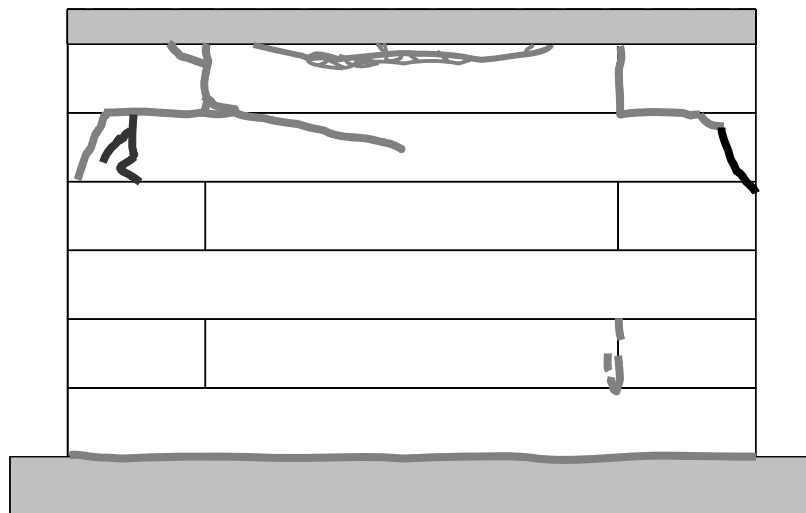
Cracking of Shear Wall Pilot Specimen 2 at Cycle 13 (local diagonal splitting cracks)
